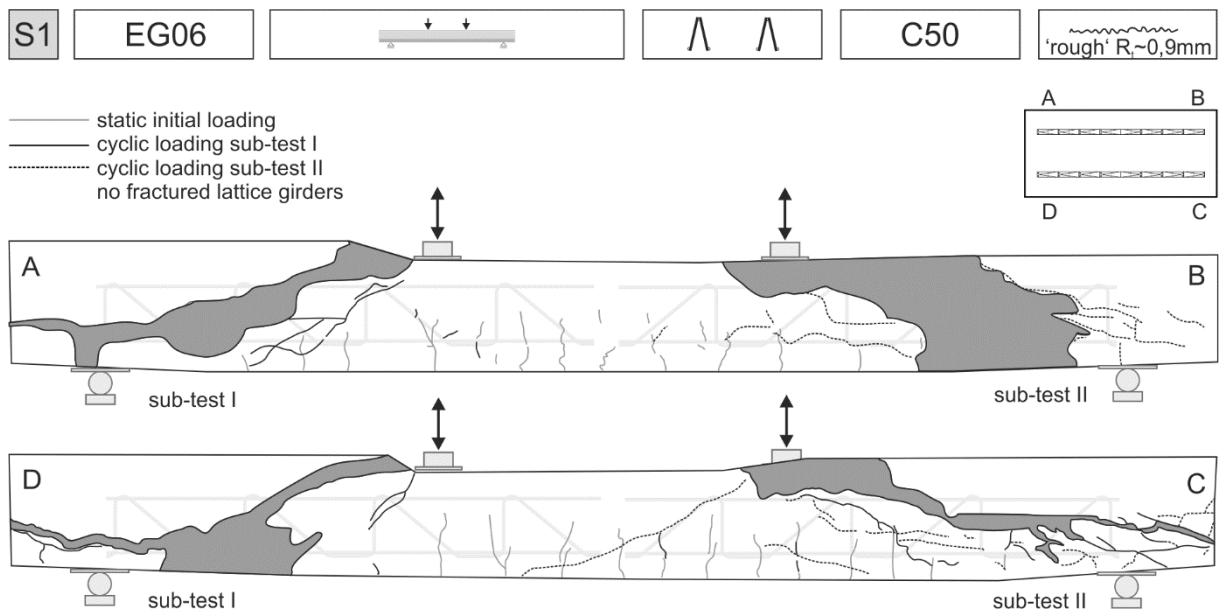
Test parameters, crack patterns and lattice girder fractures of specimen EG06
